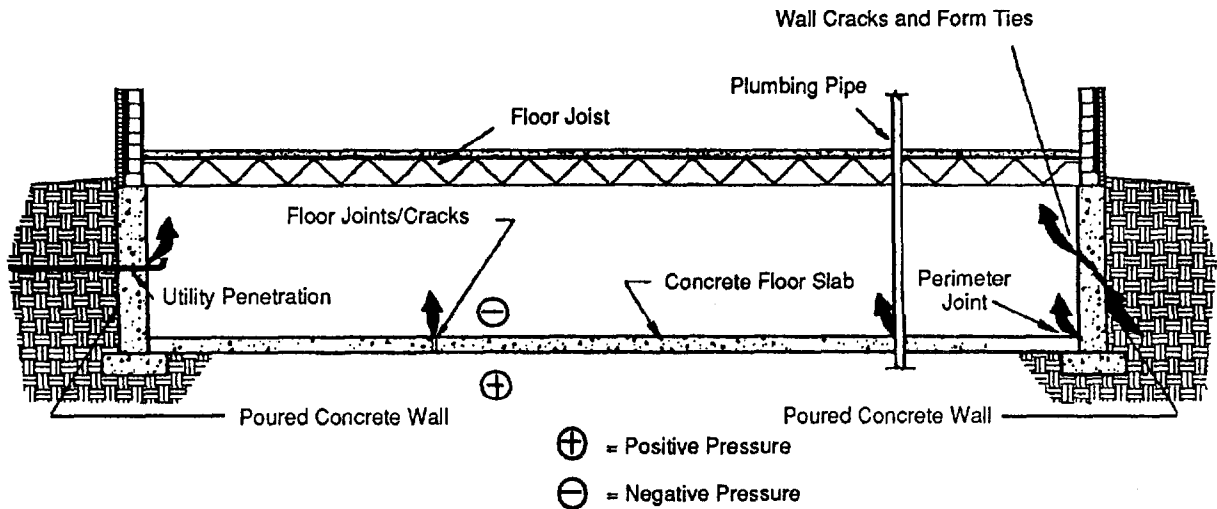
Typical radon entry routes in slab-on-grade construction.
